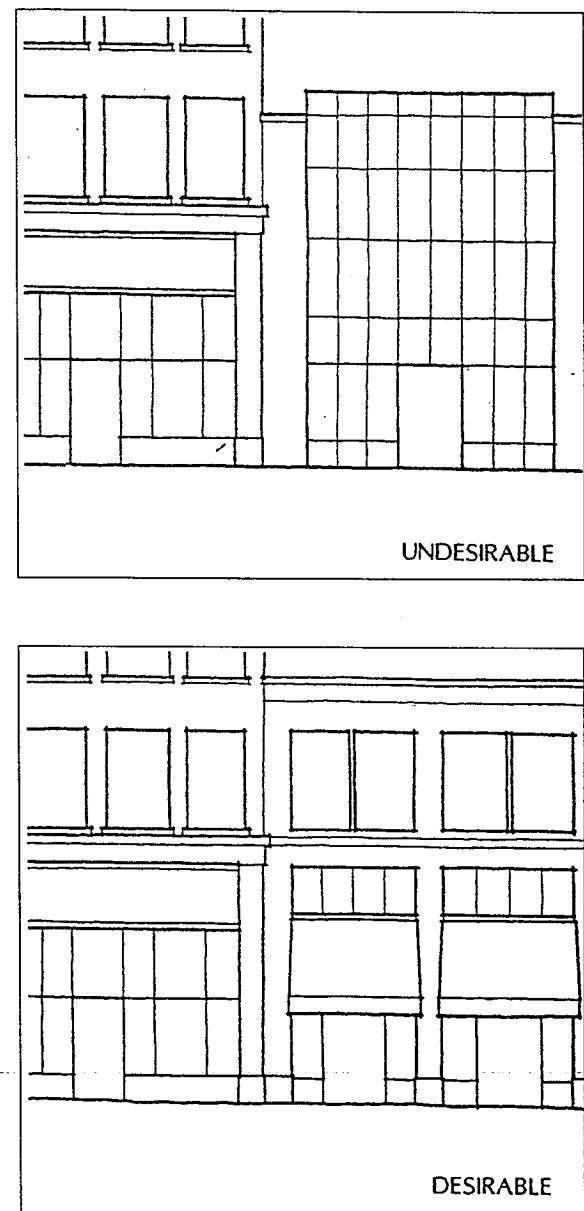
New and renovated buildings shall respect the style and proportions of existing facades.
